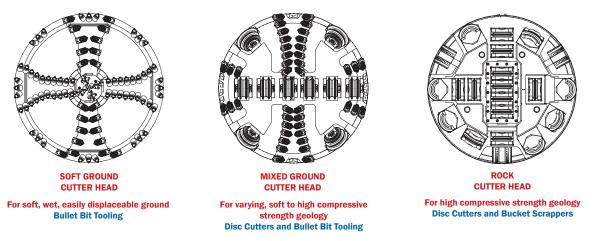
Standard Microtunneling Boring Machine cutter head configurations.
